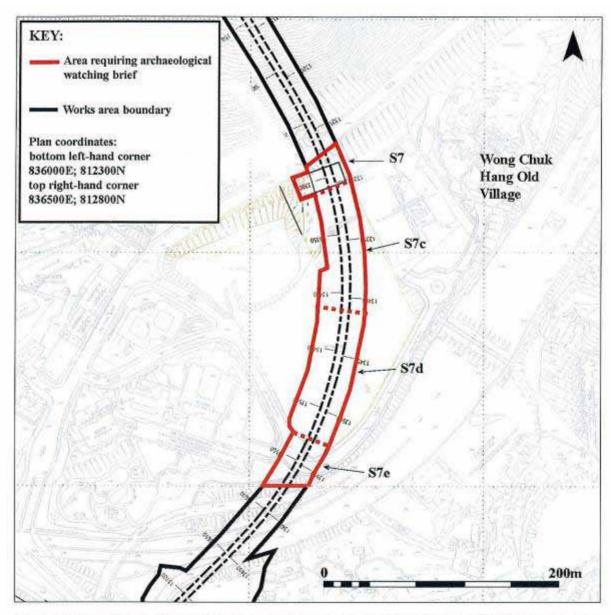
Plan of works sites S7, S7c, S7d and S7e west of Wong Chuk Hang Old Village with area requiring archaeological watching brief outlined in red.
